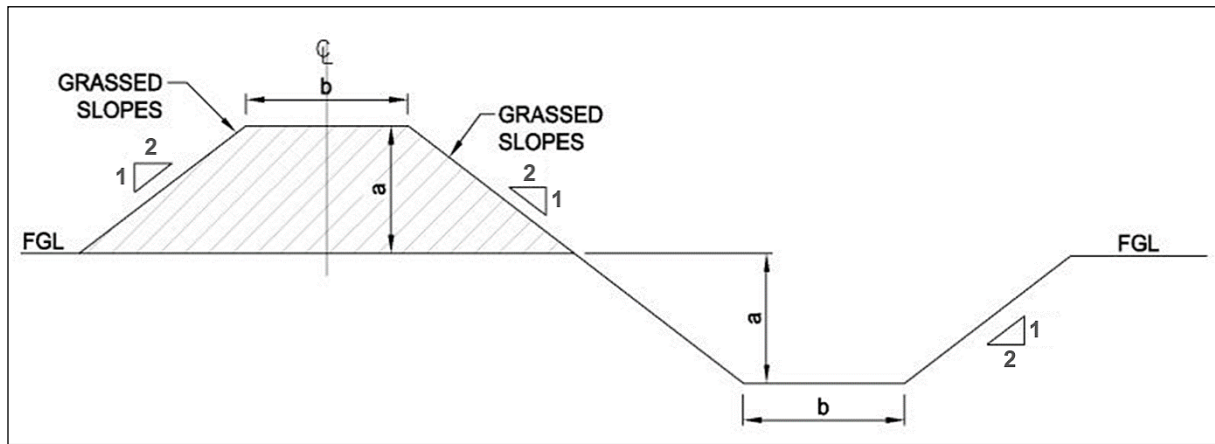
TYPICAL BERM AND CHANNEL FOR STORMWATER DIVERSION SYSTEM
